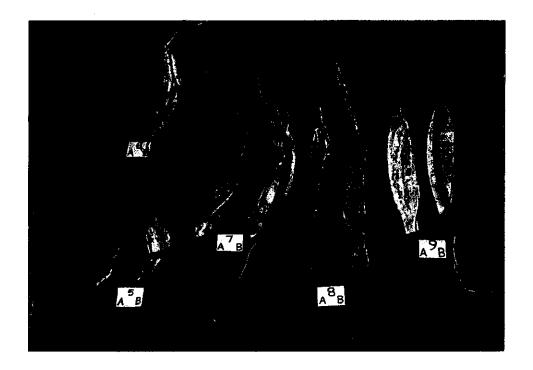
Conduit sections 5, 6, 7, 8 and 9 cut for examination.
